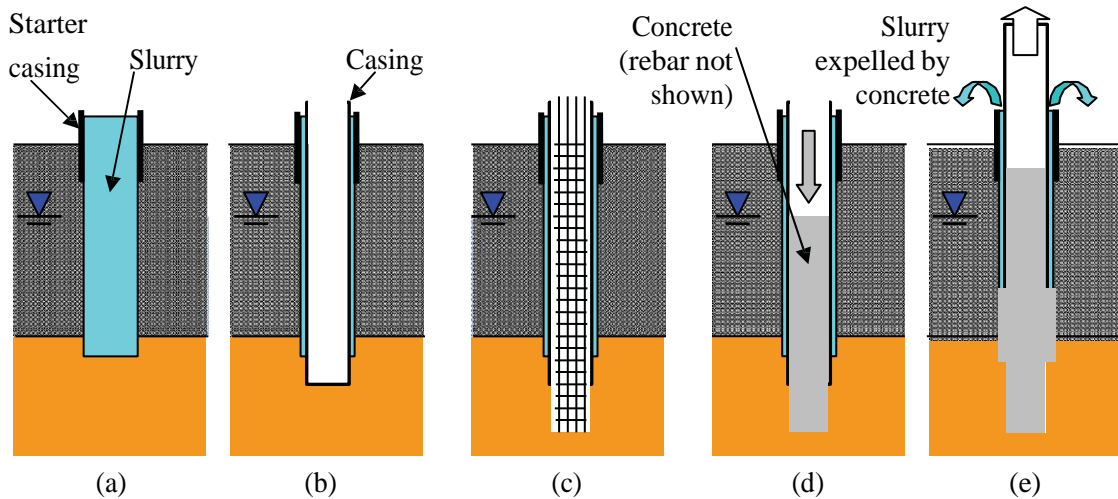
Construction using casing through slurry-filled starter hole: (a) drill with slurry; (b) set casing and bail slurry; (c) complete and clean excavation, set reinforcing; (d) place concrete to head greater than external water pressure; (e) pull casing
